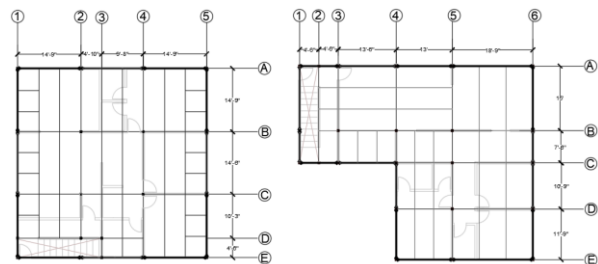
Structural design imposed over architectural plans: Building 1 (left) and Building 2 (right), with MRFs shown along each perimeter
